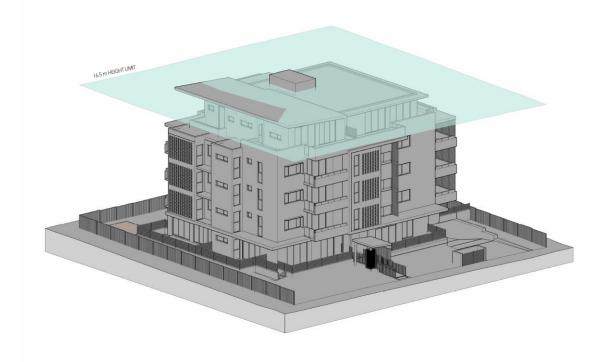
Source: Zhinar Architects – Amended Building Height Plane Diagram
